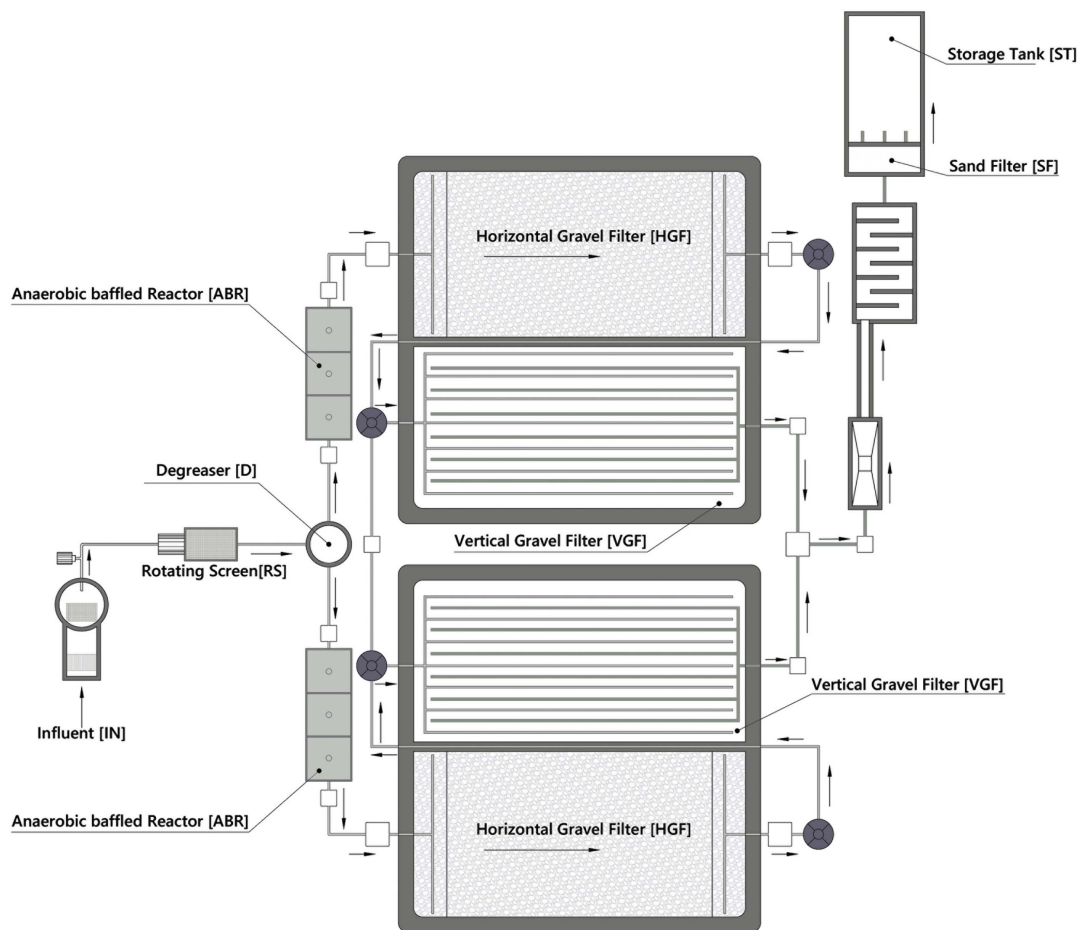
Plan view of the Tolata wastewater treatment plant.
